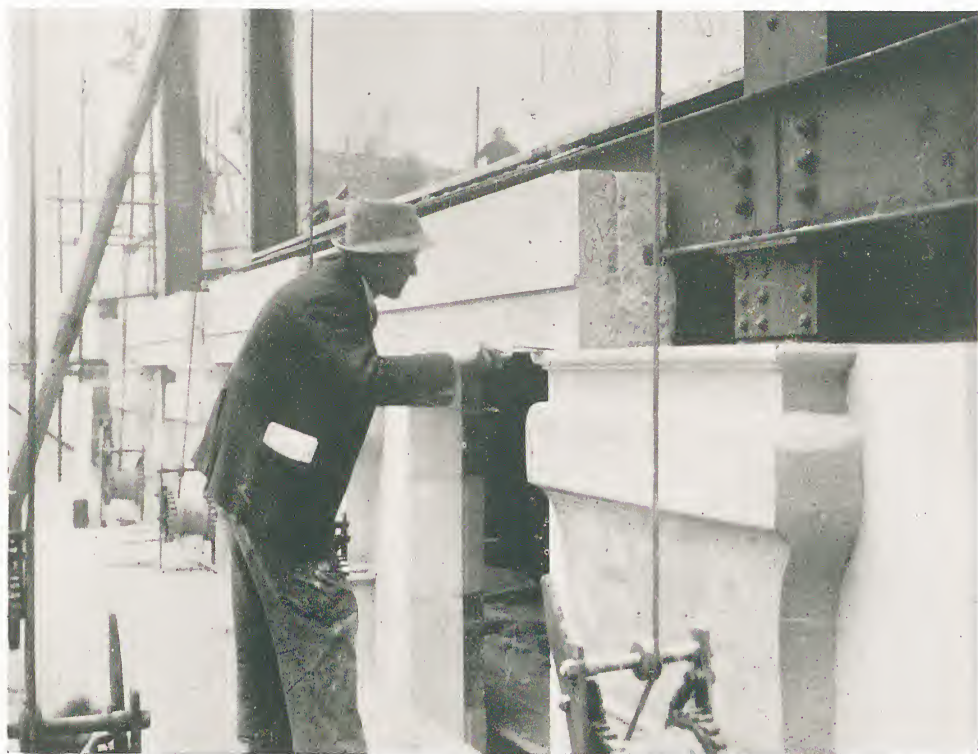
CONSTRUCTION OF STONE HEAD AND STEELWORK.
